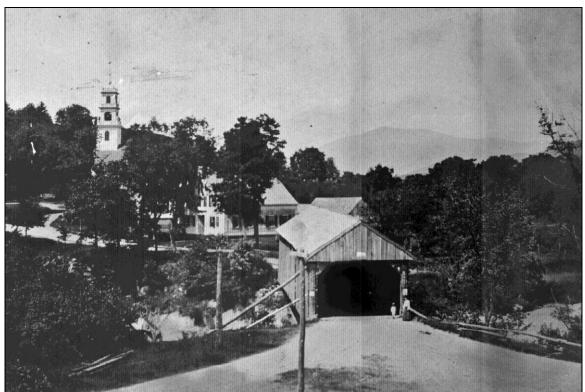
Village Covered Bridge or "Great Bridge," built 1866, demolished 1909 for construction of present steel truss bridge (Source: Wentworth Town Scrap Book).
